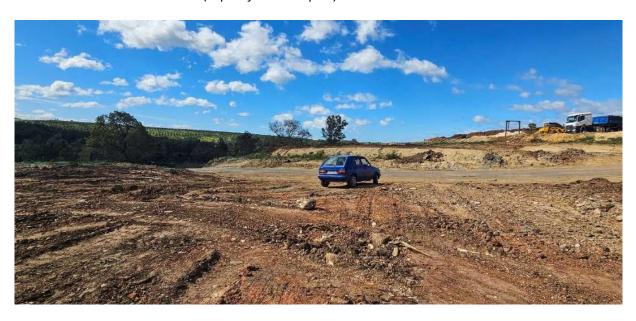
The photo shows the fill platforms that were created to limit run-off from the site.
